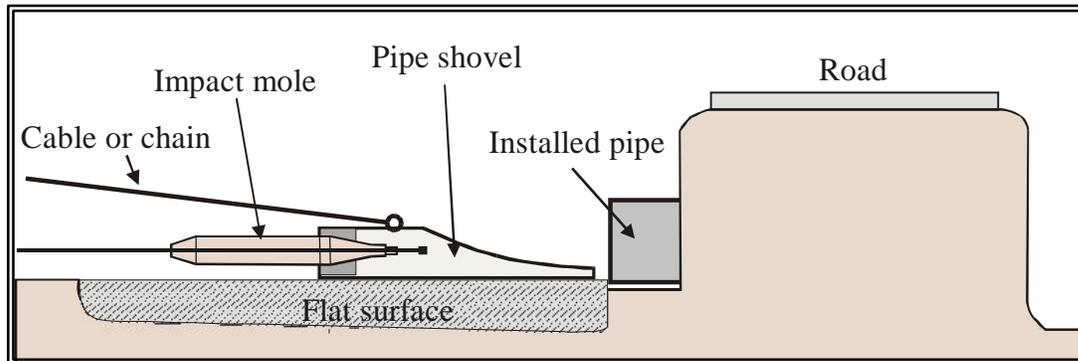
Spoil removal using a fabricated pipe shovel (Vermeer)
